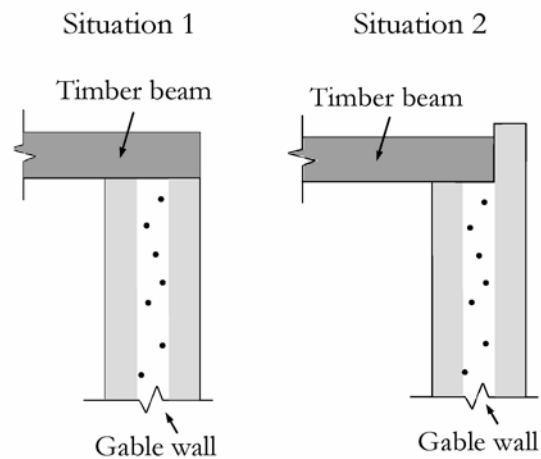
Two boundary conditions (diagrams of cross-sections) for the beams belonging to the timber framework.
